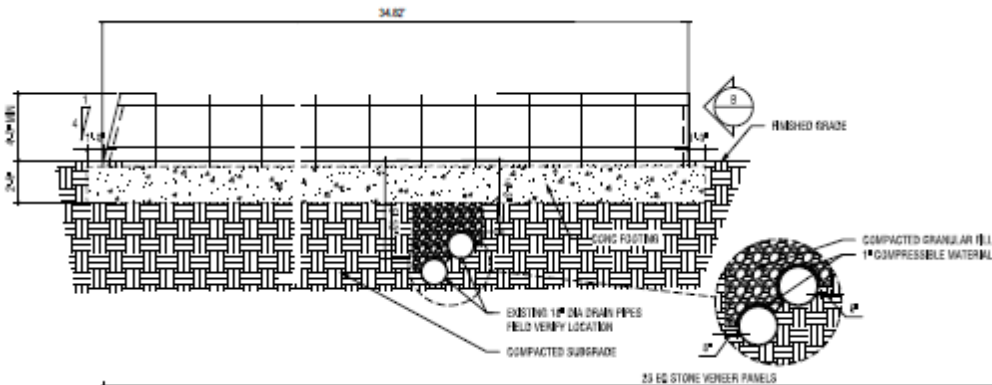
FIGURE N: WESTERN STONE WALL ELEVATION WITH SIGNAGE ELEVATION SOUTH FACE
